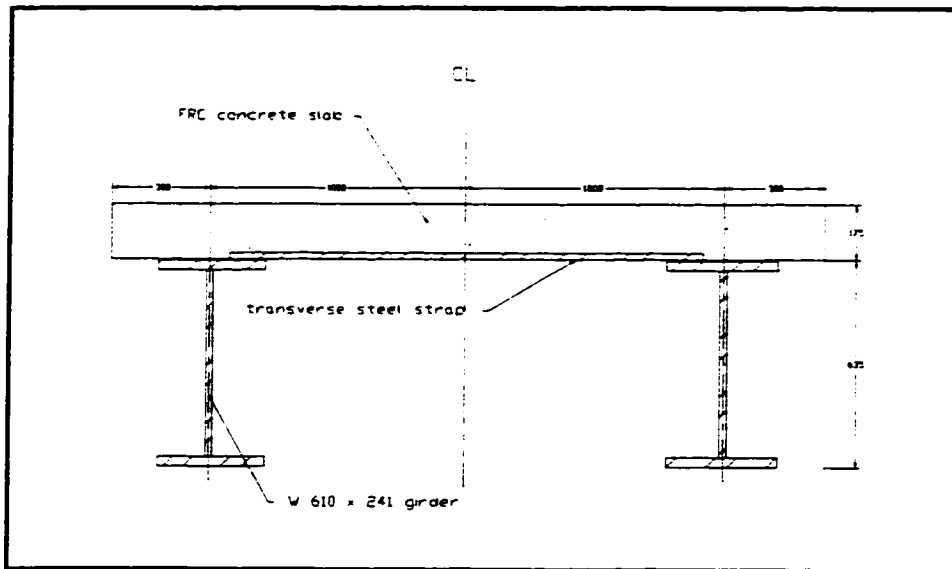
Section of an externally reinforced slab-on-girder bridge with an FRC deck slab
